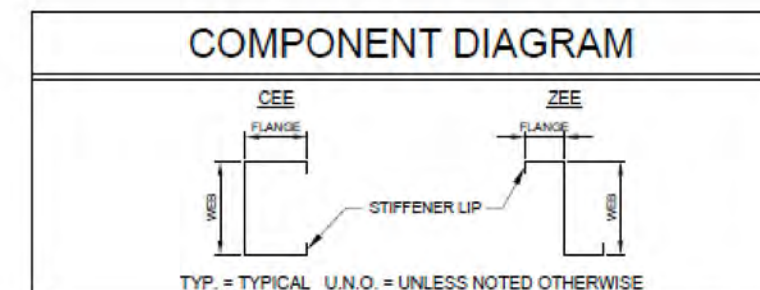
Engineering Schedule - Johns\_Lyng\_Insurance\_Builders\_-\_5227499833.2\_-\_ (7.5x16x4.9) - Engineering\_RegA5 , 19/12/2024, A05, Courtesy of Best Sheds, 2024
